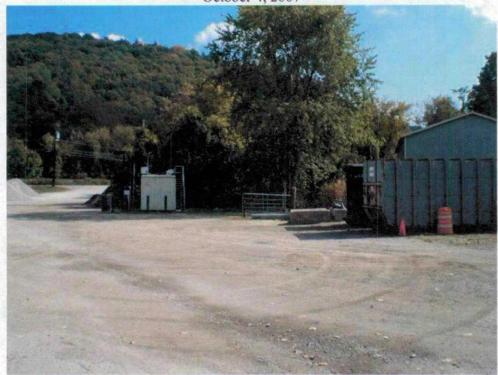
View of transfer station gravel drive with Wetland 1 in background and proposed Verizon Wireless facility to the right near dumpster and just out of the photo, looking northeast.
